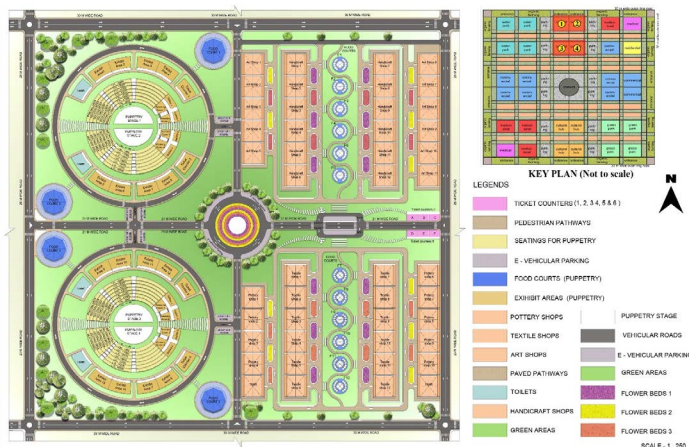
The proposed plan of any one of the Green parks for the proposed Ideal Township (source author).
